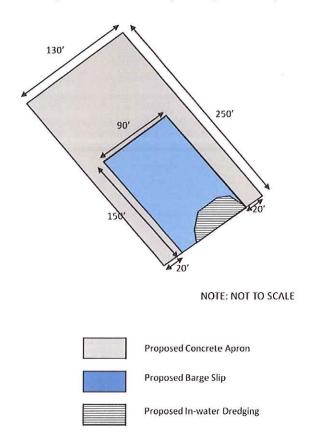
Turkey Point Units 6 & 7 Equipment Barge Unloading Area - Excavation and Regrading Areas
